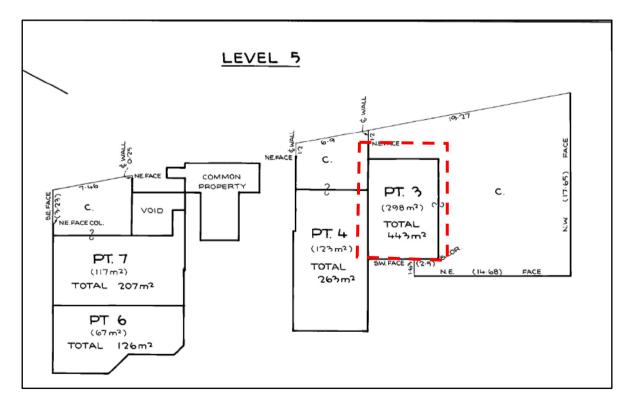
Strata Plan 32515 (extract) detailing the first floor (Level 5) location of Suite 3 and adjoining courtyard (See also Figure 16).
